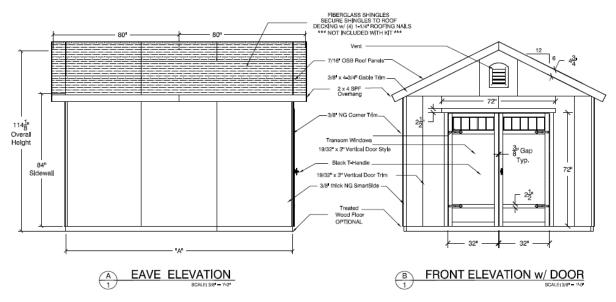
EXHIBIT B: ELEVATIONS OF PREVIOUSLY PROPOSED SHED
